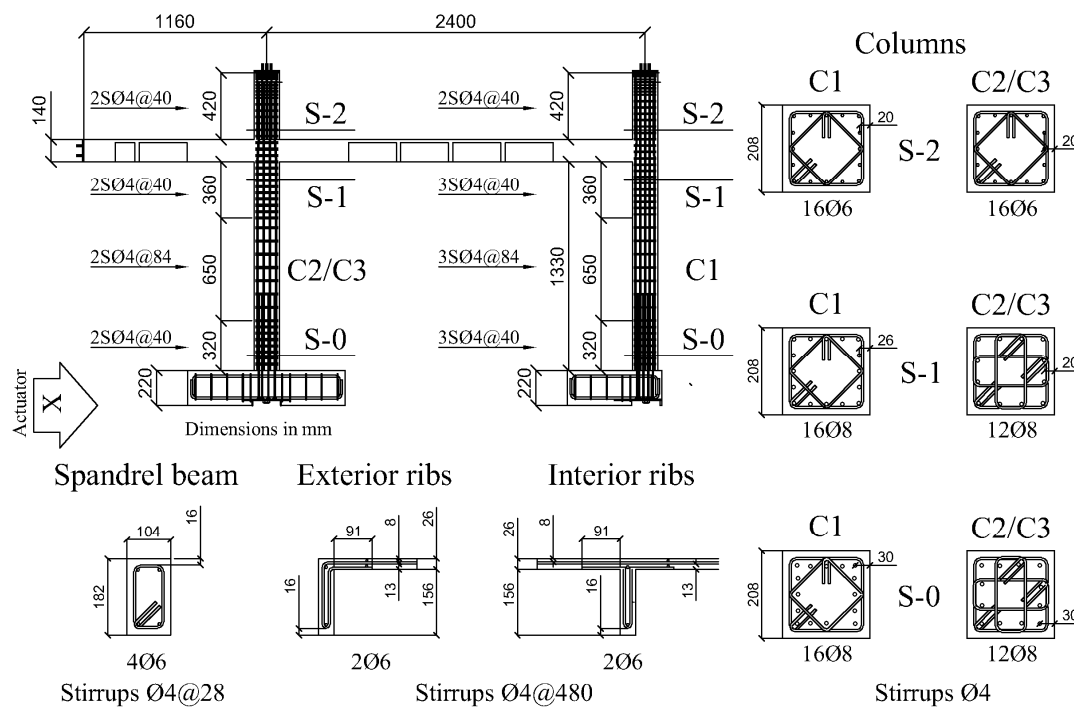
Geometry and reinforcement of the structural members of the specimen.
